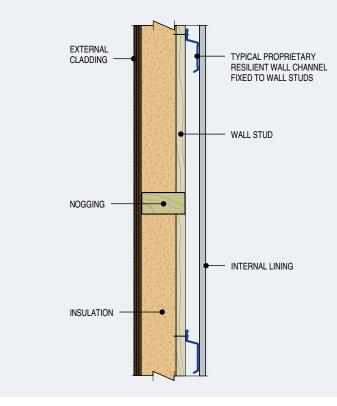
Resilient mounted wall cladding. Vertical section through wall
